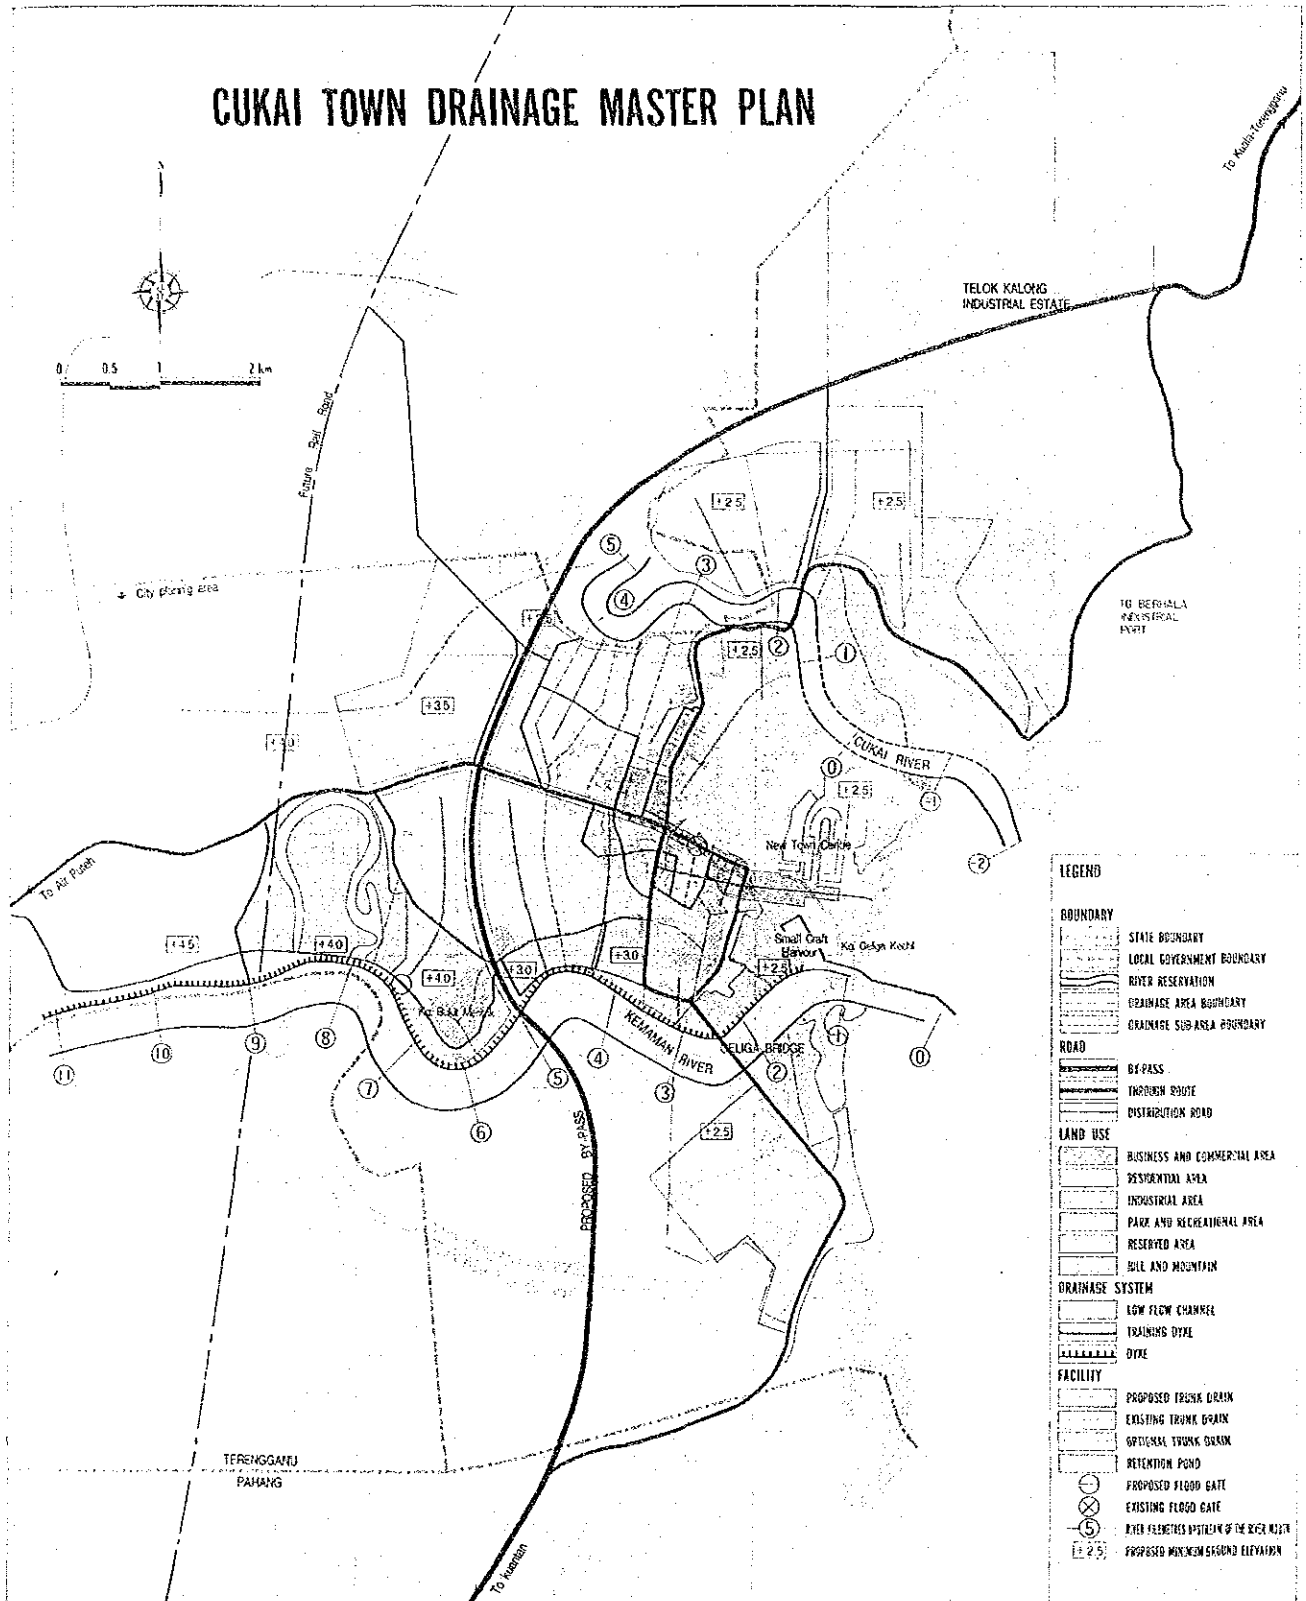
CUKAI TOWN DRAINAGE MASTER PLAN
